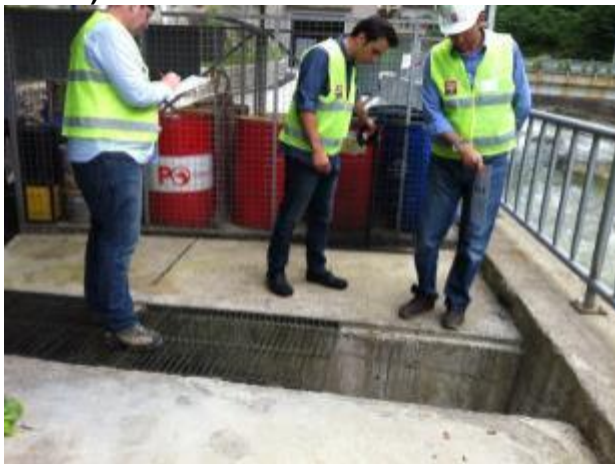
Yagmur HEPP Turbine hall at lower elevation.
